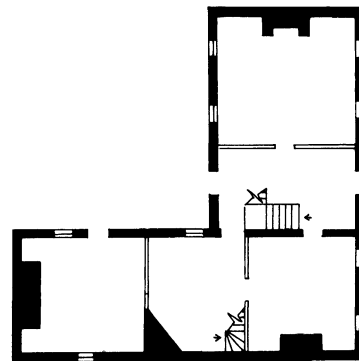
James Ramsey House Plan, with integral two-room ell. Originally, there was no door between the dining room and kitchen.
